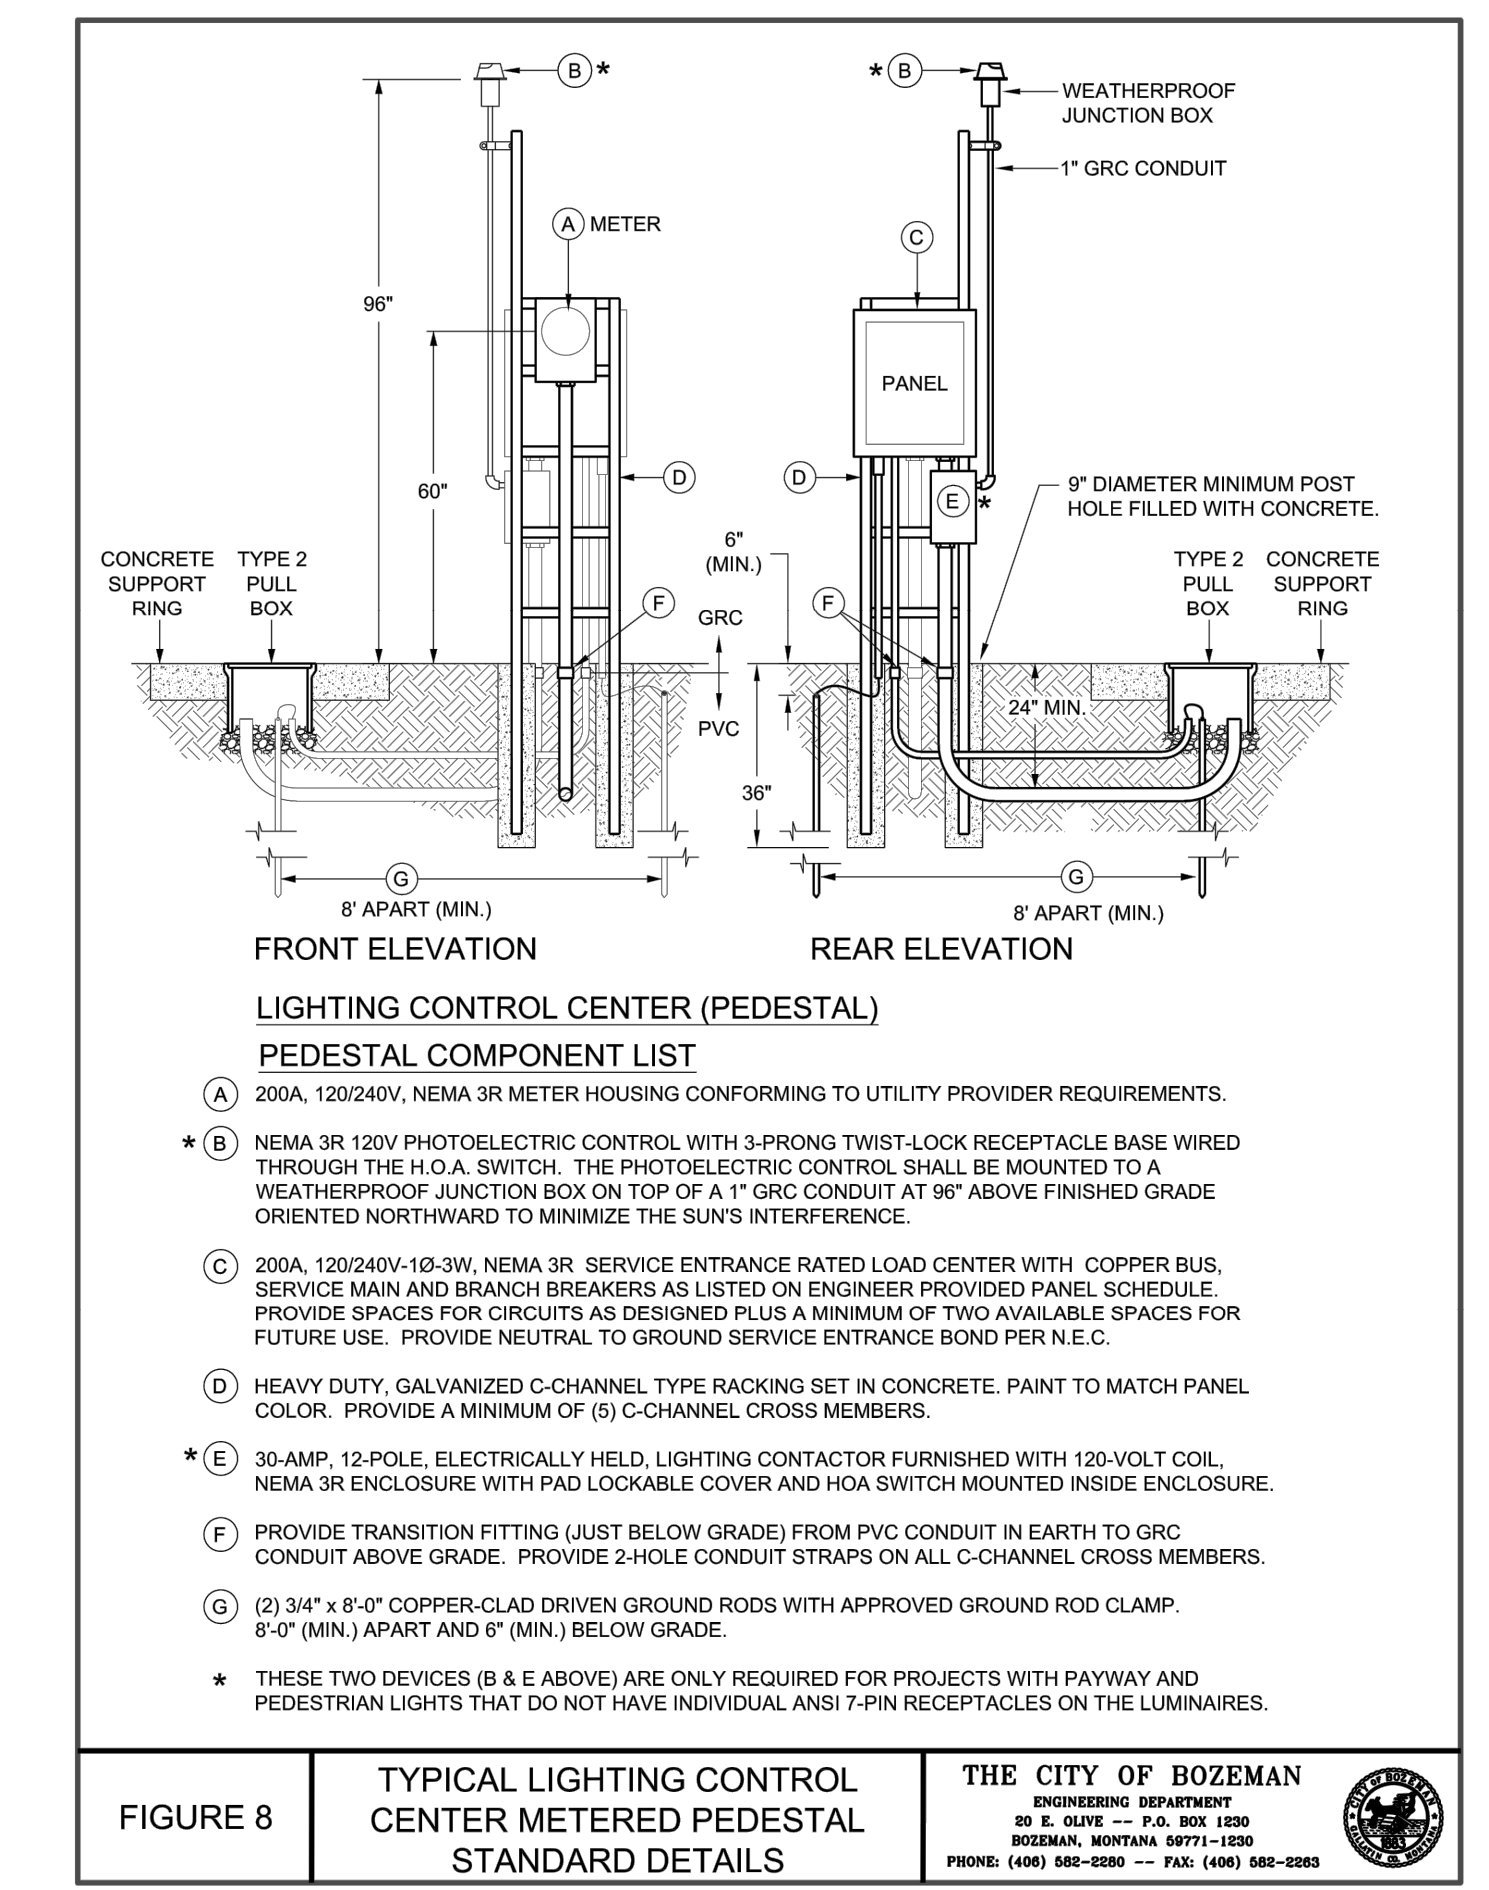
TYPICAL LIGHTING CONTROL CENTER METERED PEDESTAL STANDARD DETAILS
